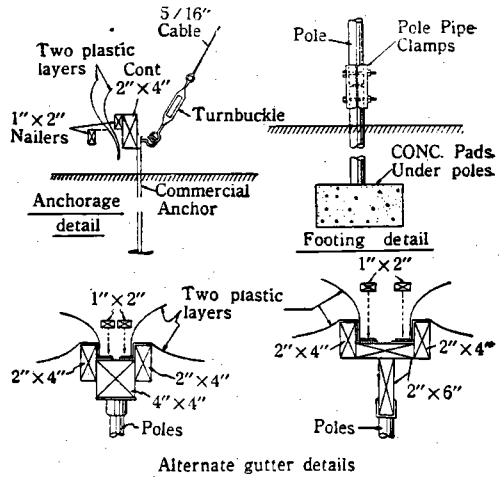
Construction details of 48' x 48' experimental greenhouse.
